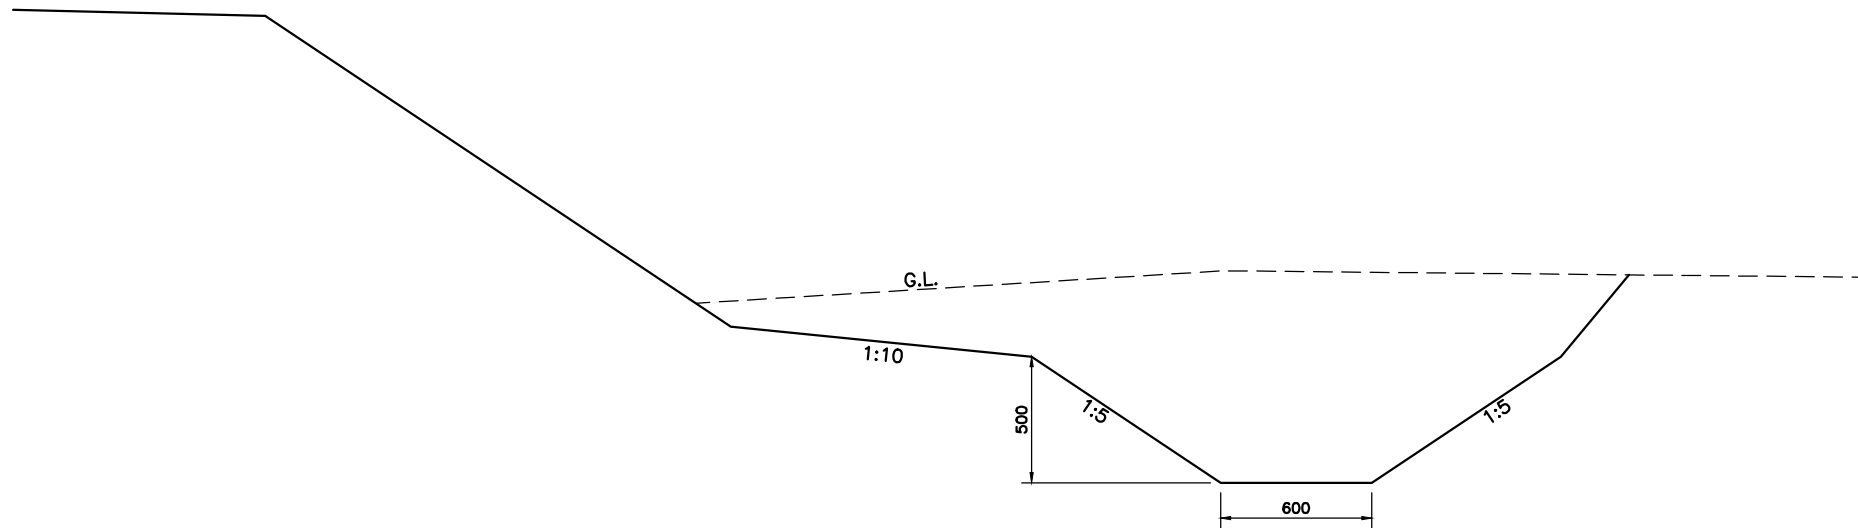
DETAILS OF CONCRETE BLOCKS OF M15 FOR SLOPE PROTECTION
